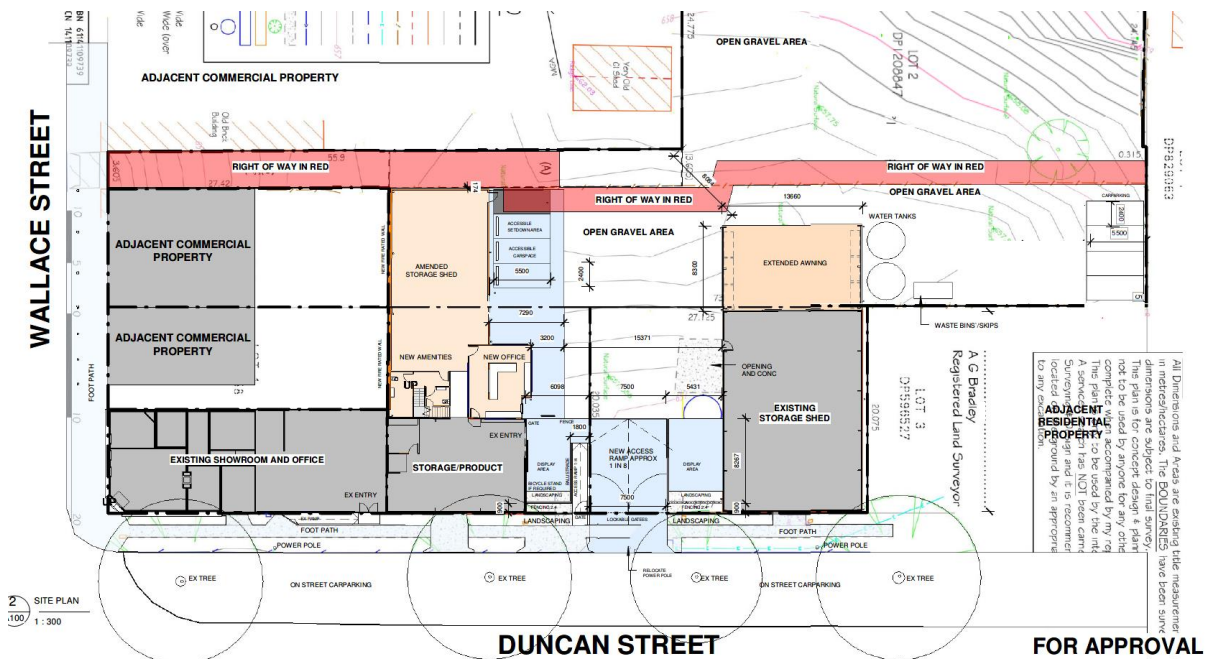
Site Plan Original Proposal Under DA.2020.1172
